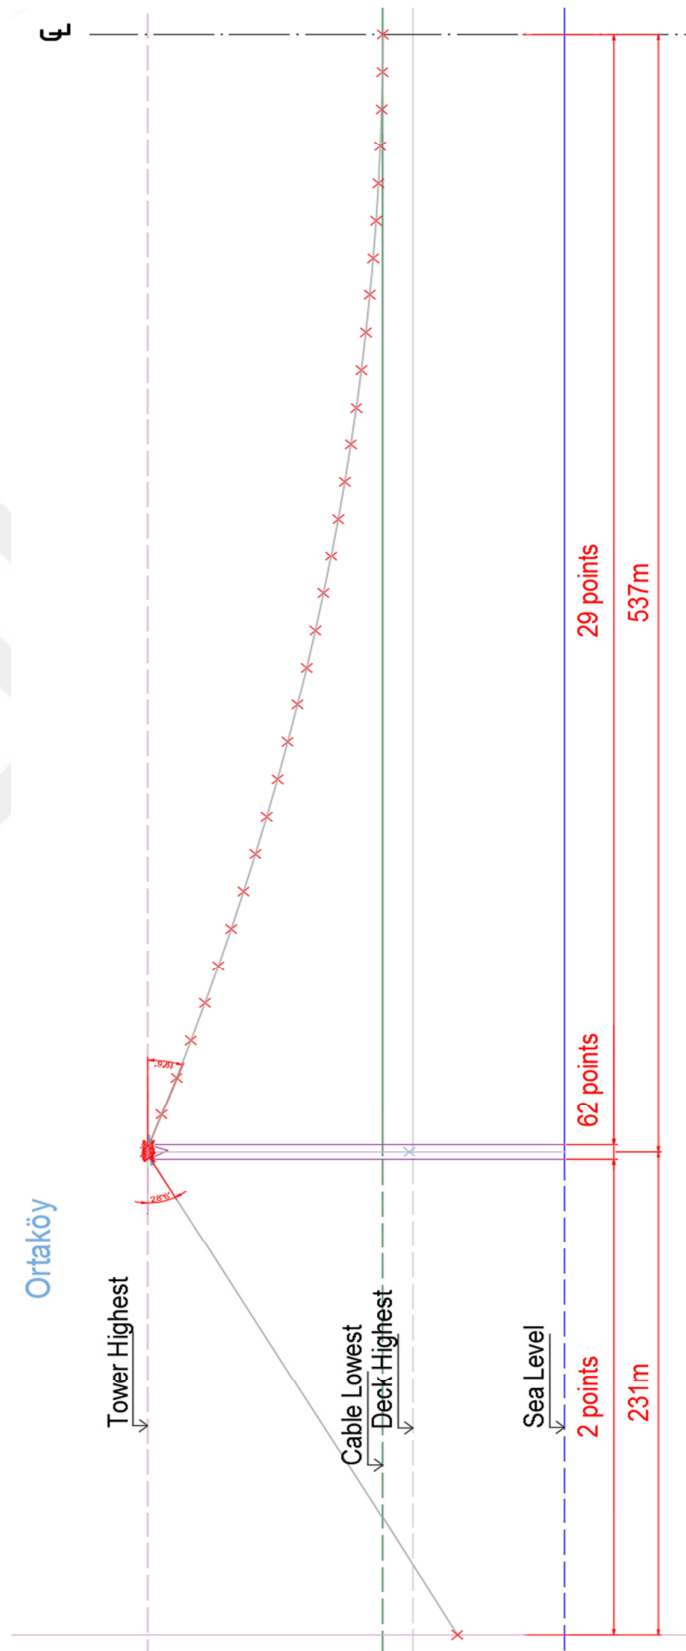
Points extracted from AutoCAD drawings to create main cables
